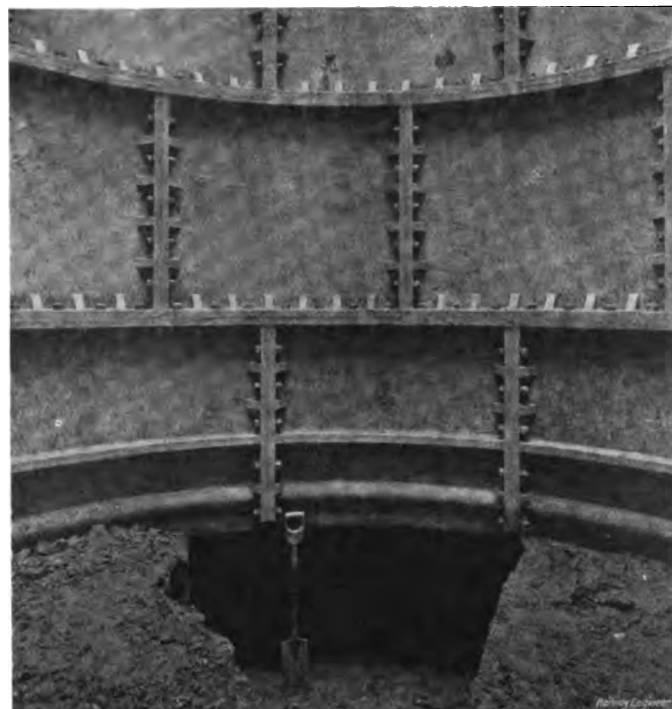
Undercutting a Cast Iron Cylinder 30 feet deep for the concrete foundations. Bridge over River Lea.
